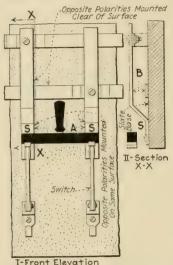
Part of panel-board showing parts of opposite polarity outside of the area bounded by the switch mechanism "mounted on same surface" and "mounted clear of surface."
